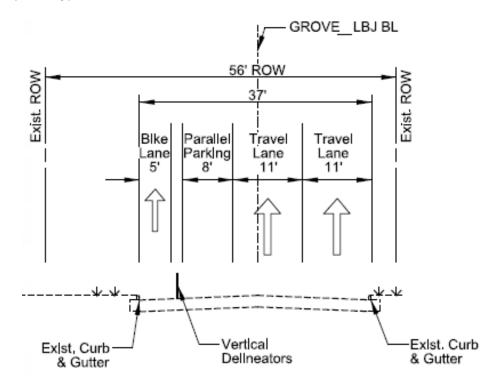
, Proposed Typical Section on S. LBJ Drive between Grove Street and Railroad Tracks
